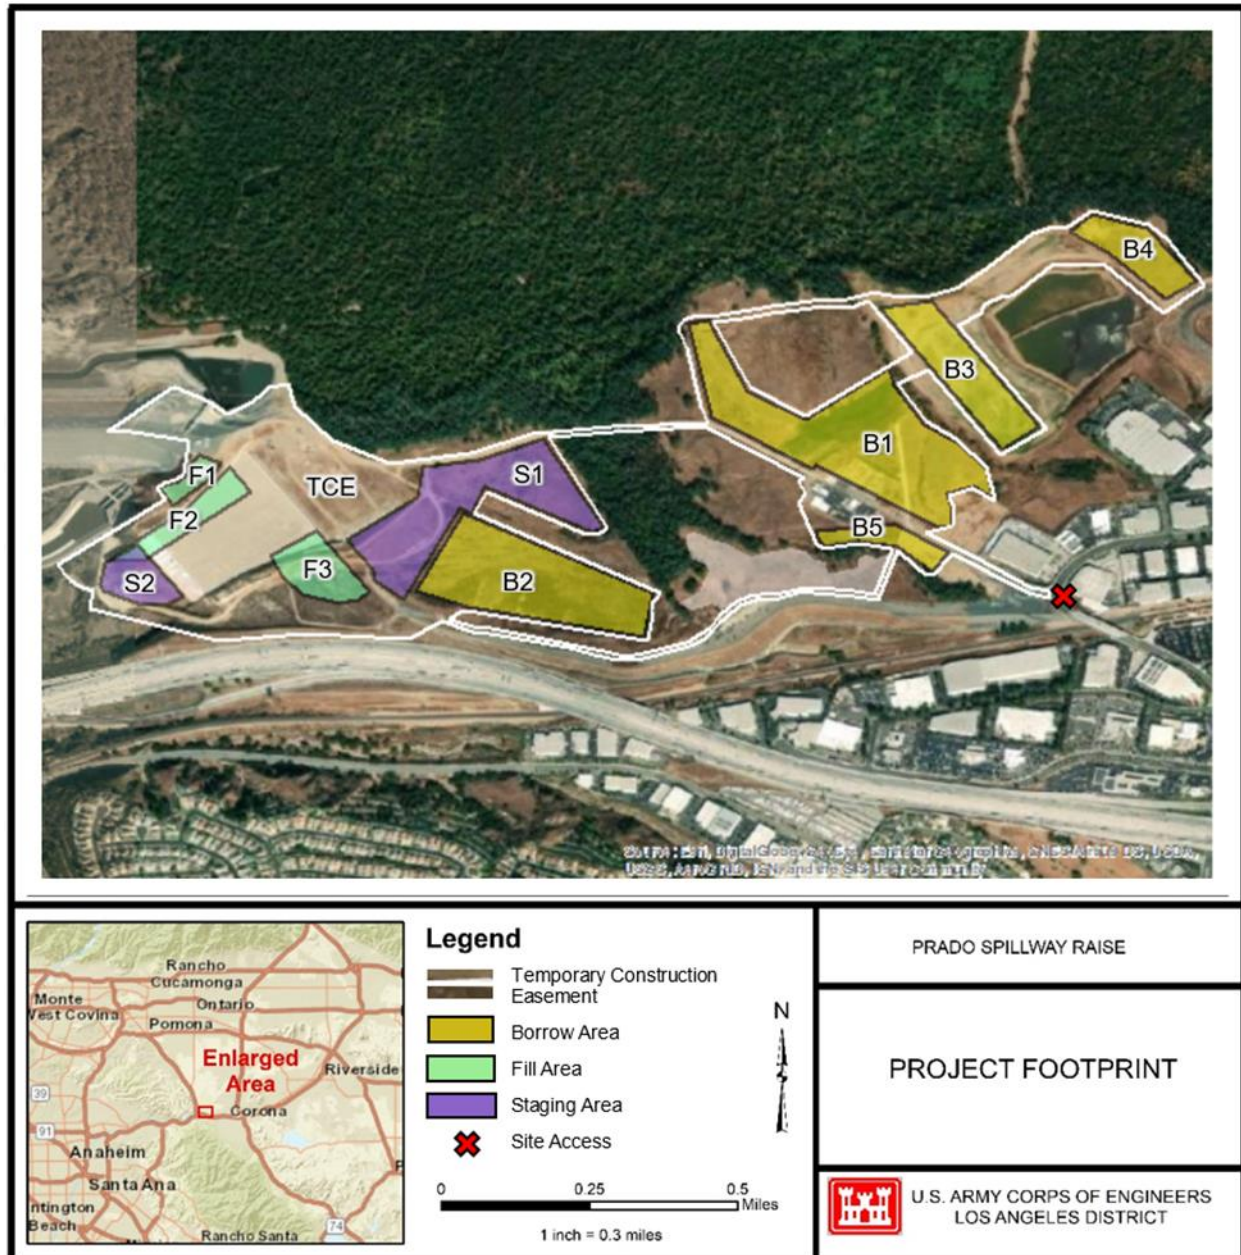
Proposed Project Footprint or Temporary Construction Easement (TCE)
